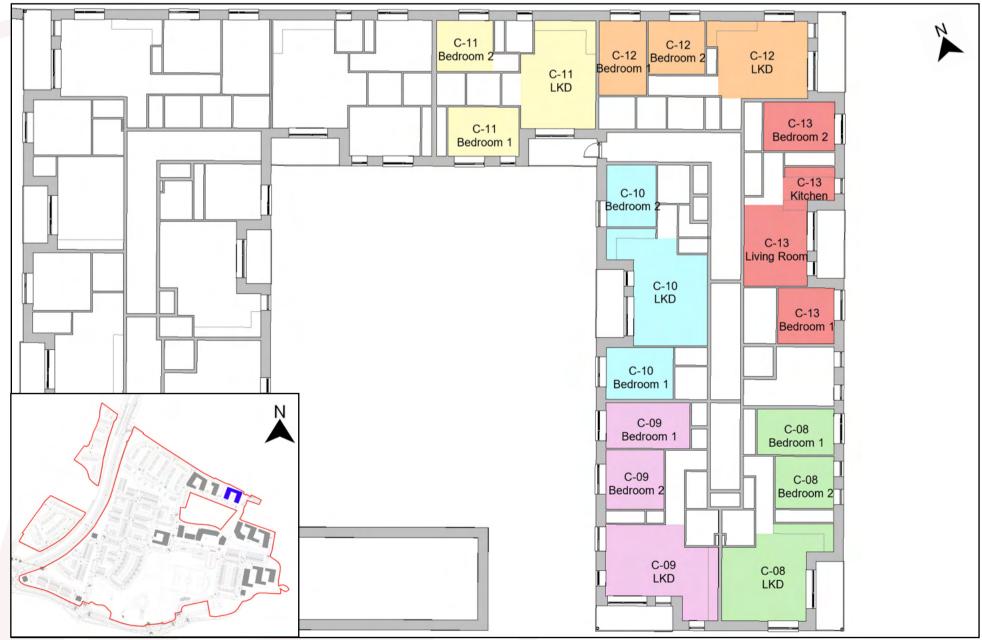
Floor plan of assessed building & Keyplan highlighting the assessed building.
